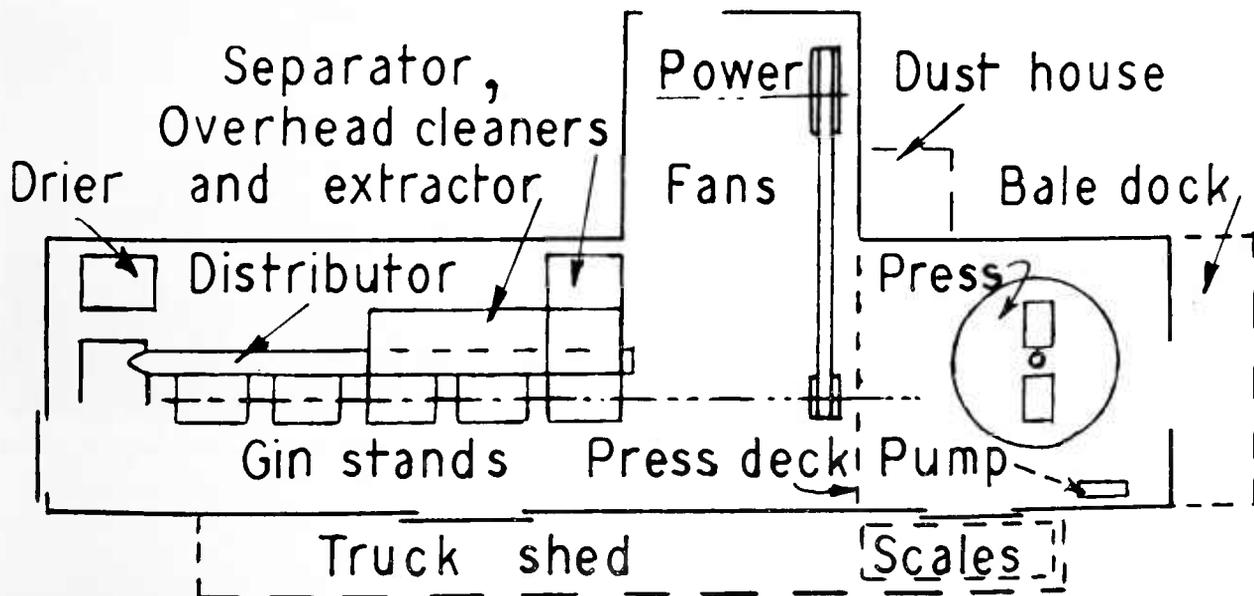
Floor plan of old-style cotton gin, with power drive between gins and press.
